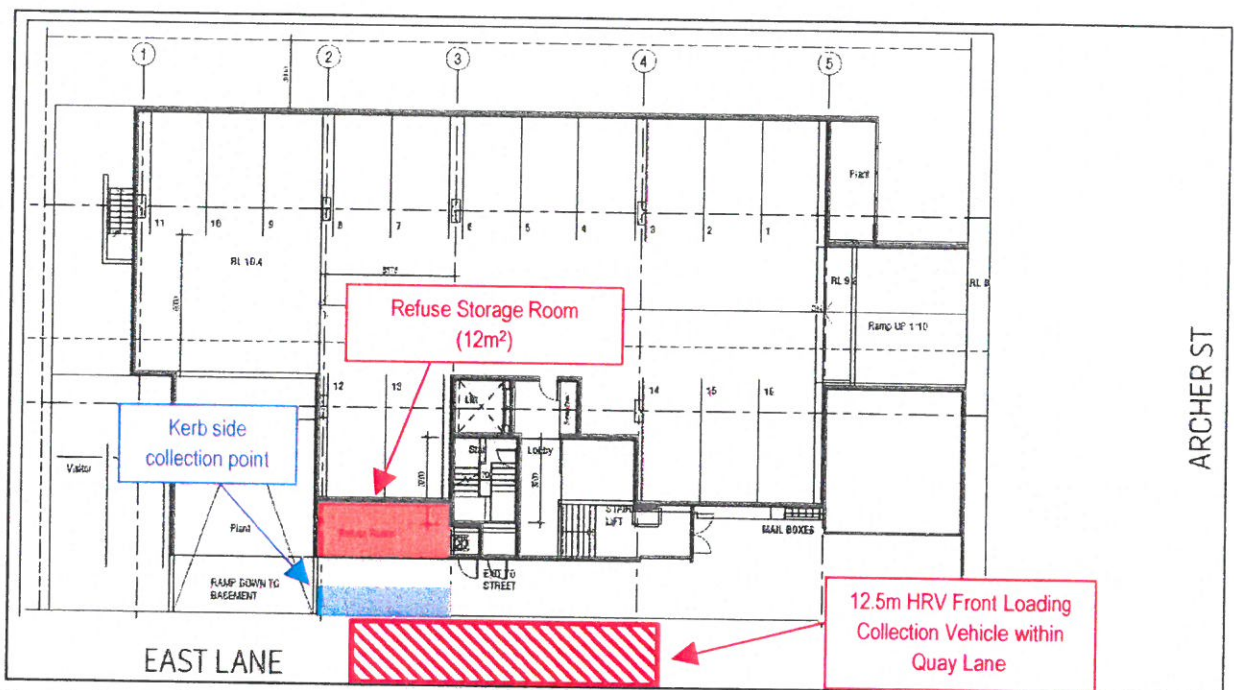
Proposed Refuse Storage Area and Kerbside Waste Collection Location
